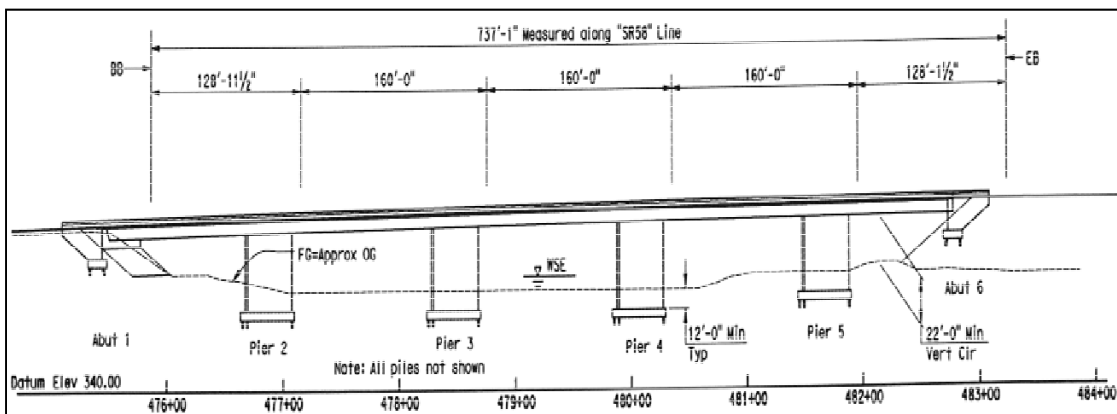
Profile of Bridge Widening over the Kern River (Alternative C)
